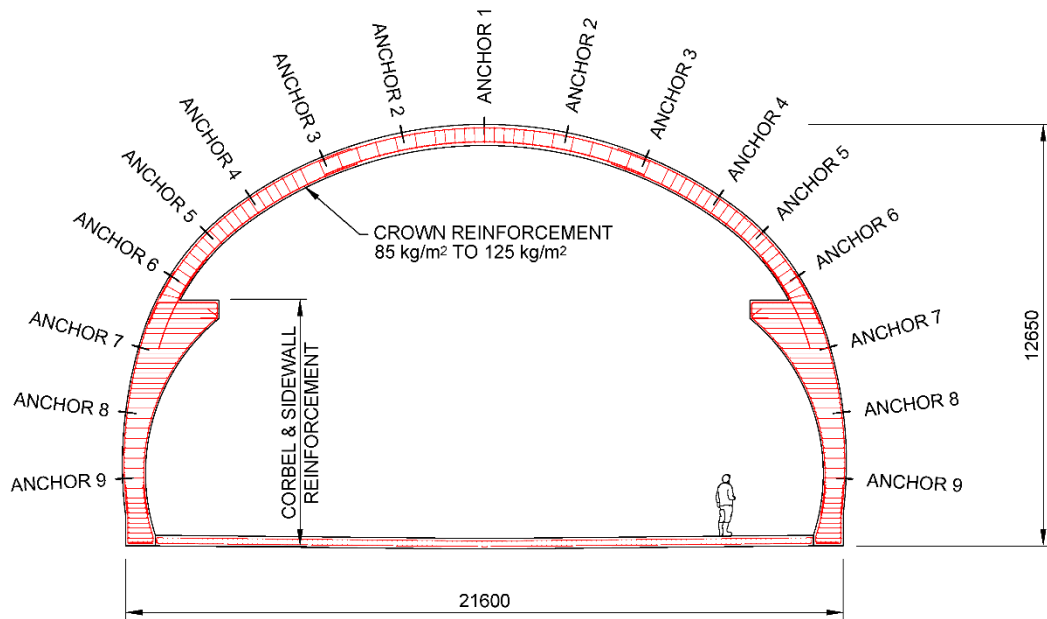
Boggo Road Station cavern lining reinforcement and adopted BA anchor layout.
